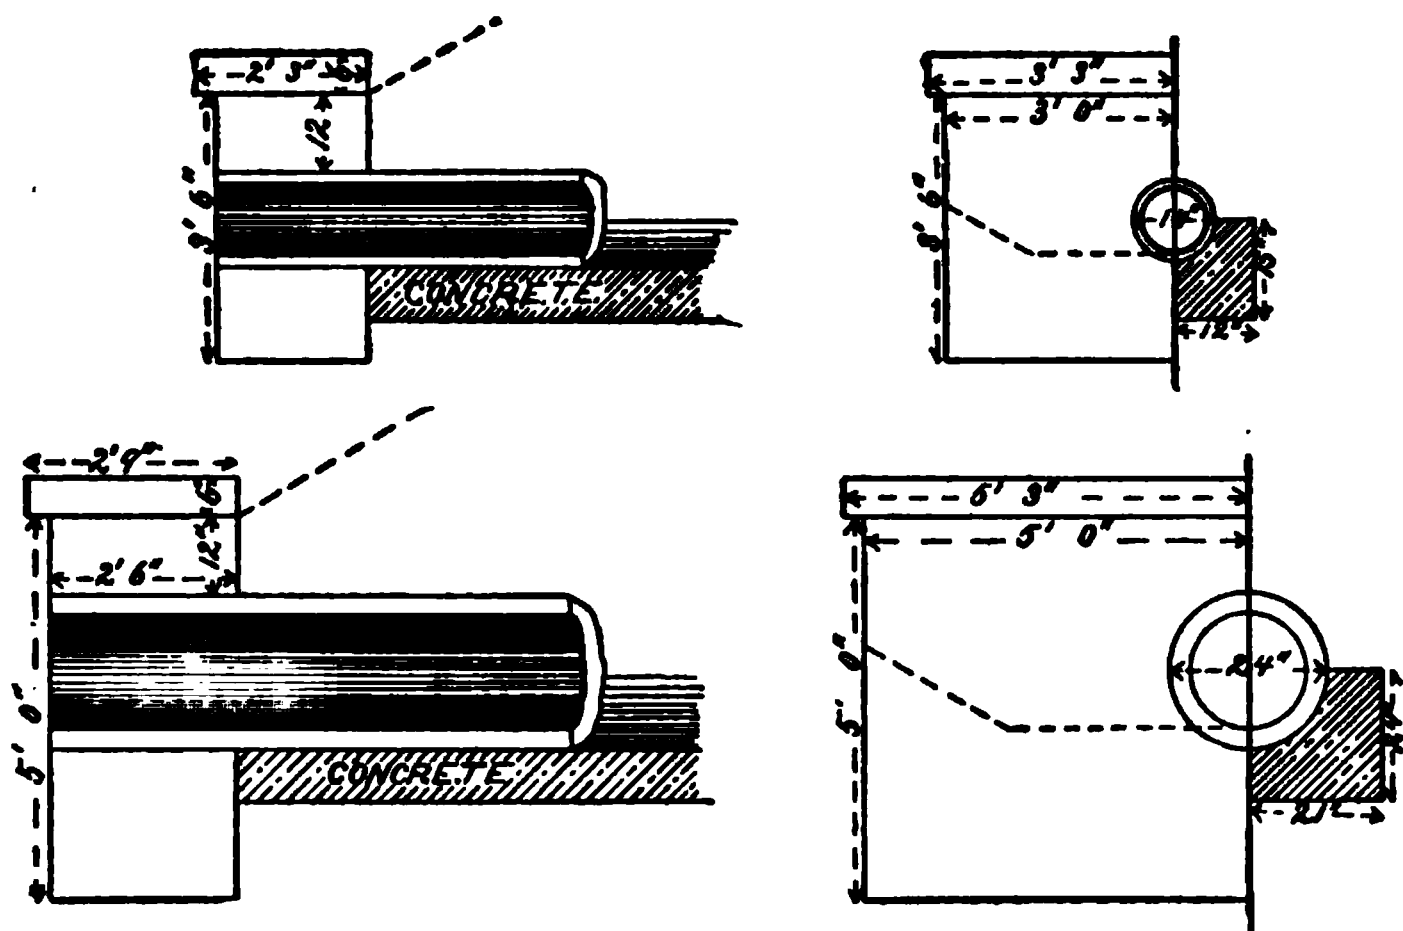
STANDARD VITRIFIED PIPE CULVERT.—K. C. & O. R. R.
